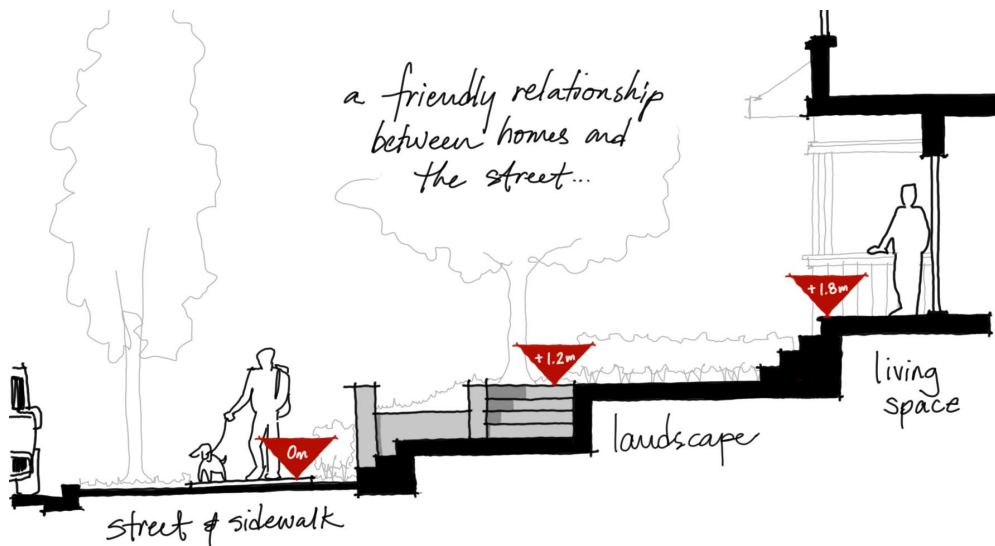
Relationship of residential entries to public sidewalks and walkways in elevation.
